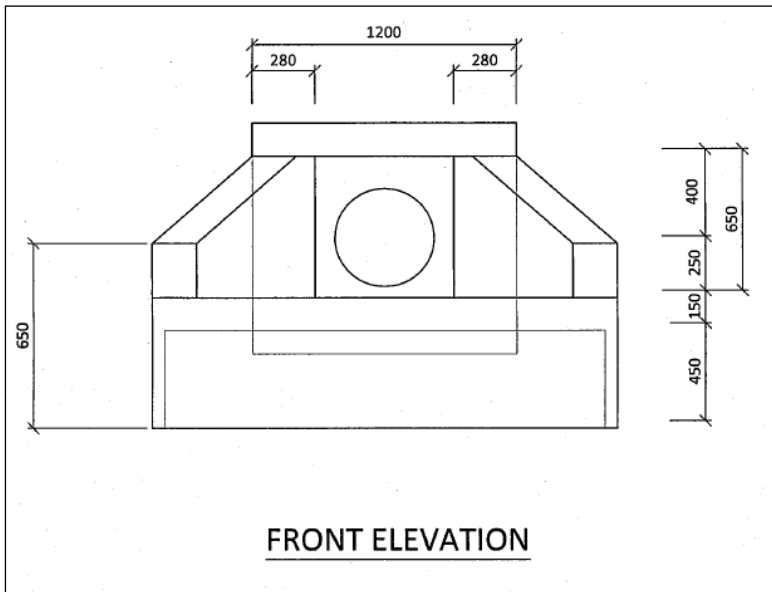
Typical Concrete Headwall Detail (Front Elevation)
